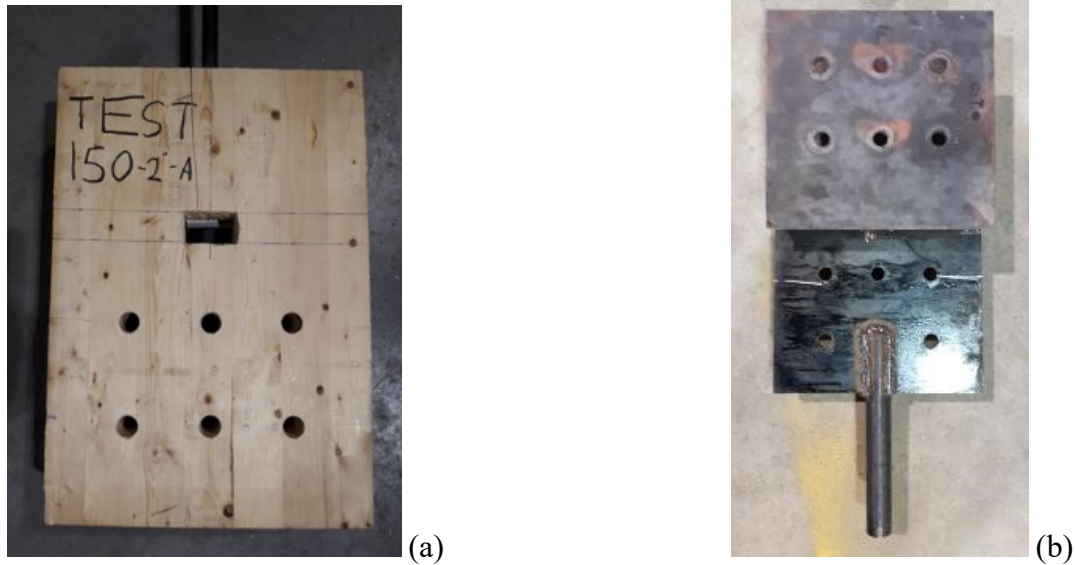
Components of a general test assembly: (a) prepared beam section; (b) tension steel attachment.
